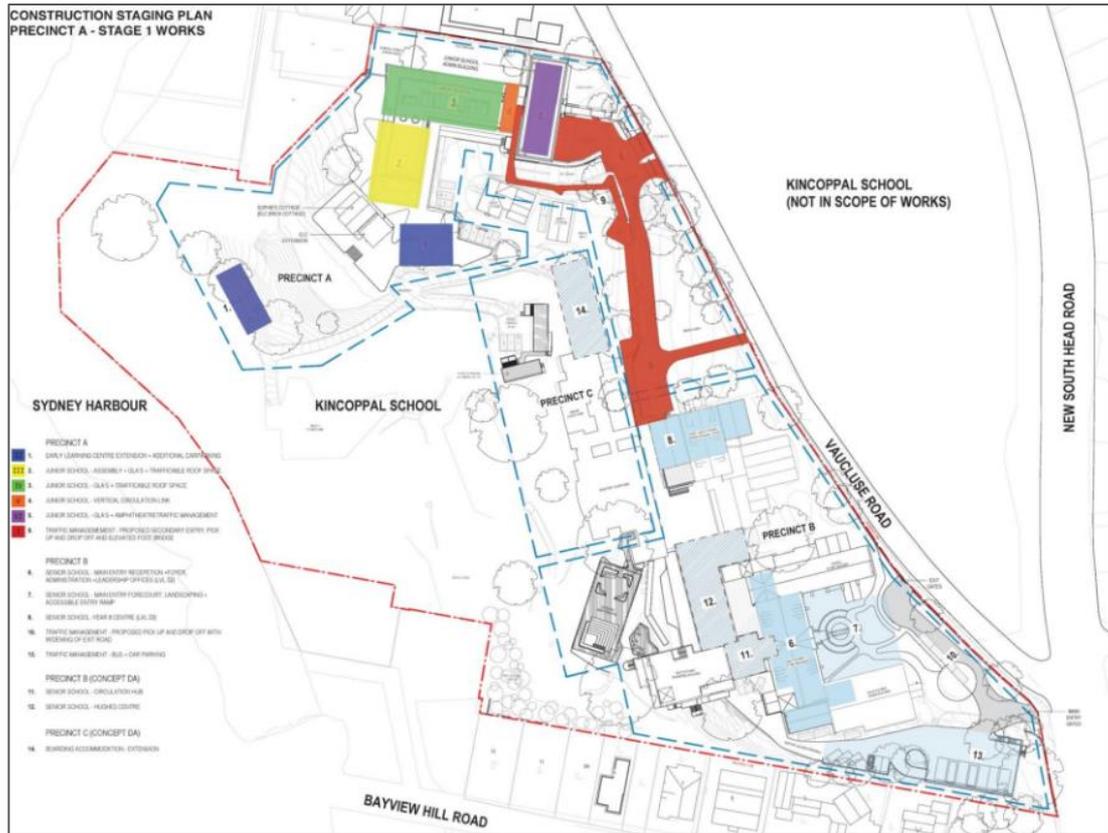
Precinct A Stage 1 Junior School Detailed Design Elements
